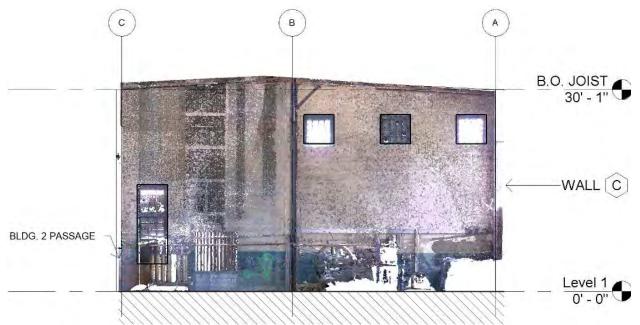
Building 1, Interior Wall C elevation from Point Cloud view.
